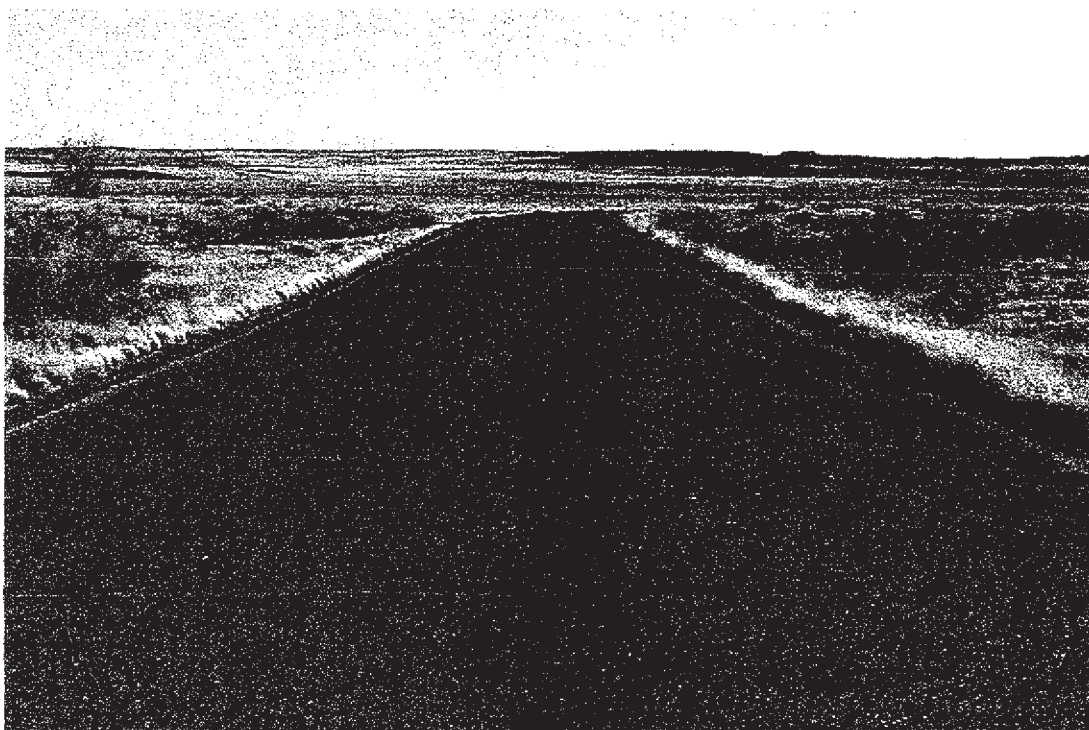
MP 1.50 - Typical Pavement Section, Looking Back
